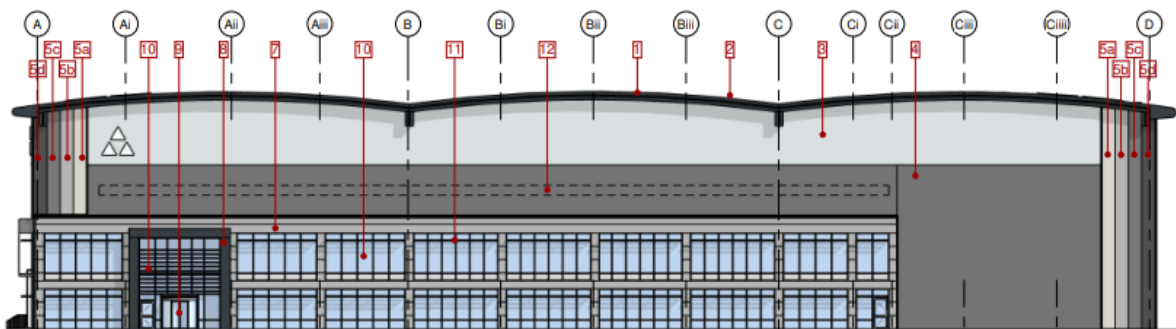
Symmetry Park Bicester Phase 3, Unit E – South-West Elevation
